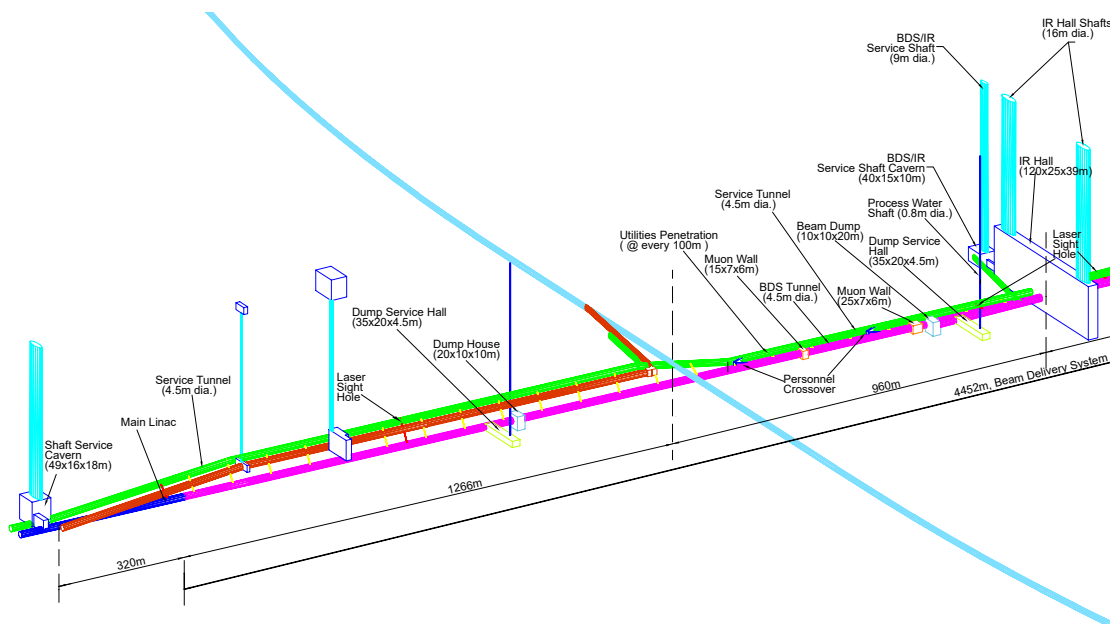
BDS layout, beam and service tunnels (shown in magenta and green), shafts, experimental hall.
